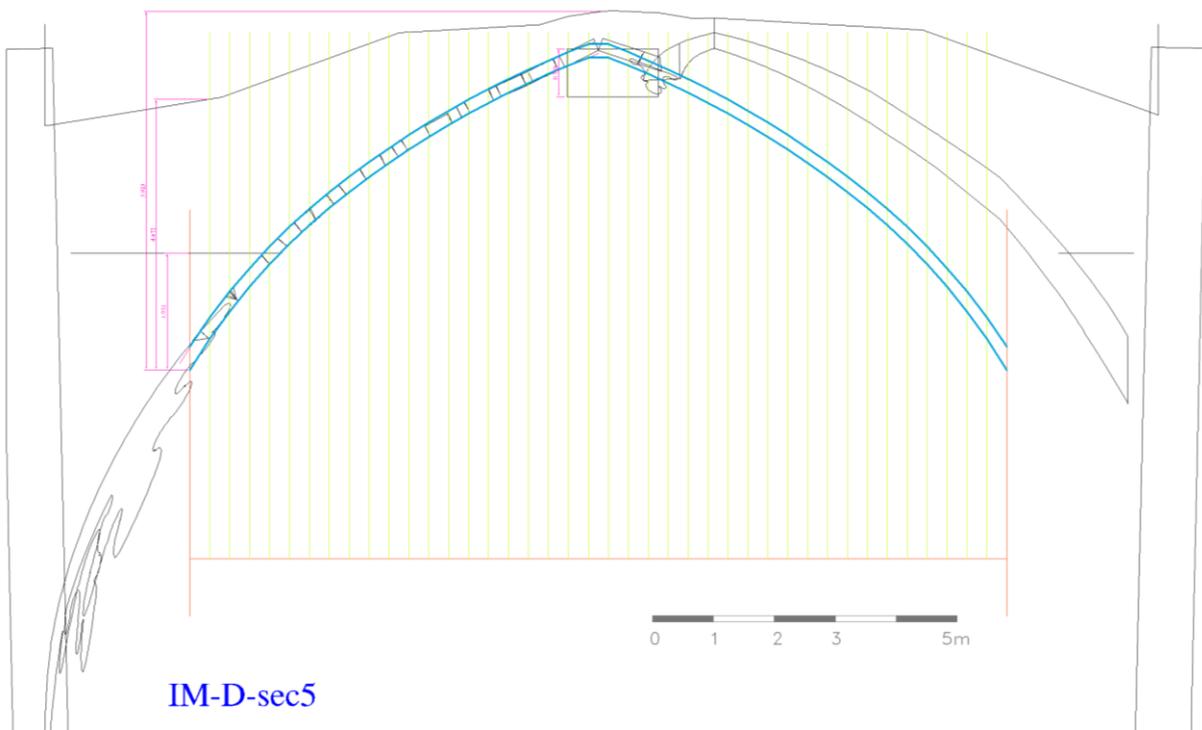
cad drawing for the proposed section IM-D-sec5.
